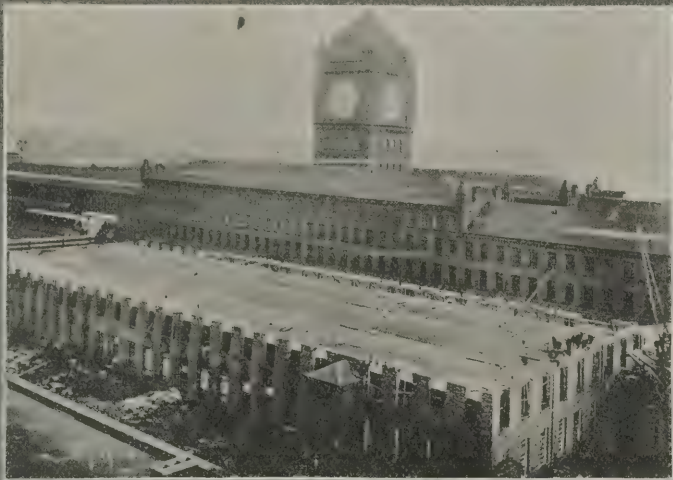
APRIL 5TH. View of second floor and roof completed and glazed.
